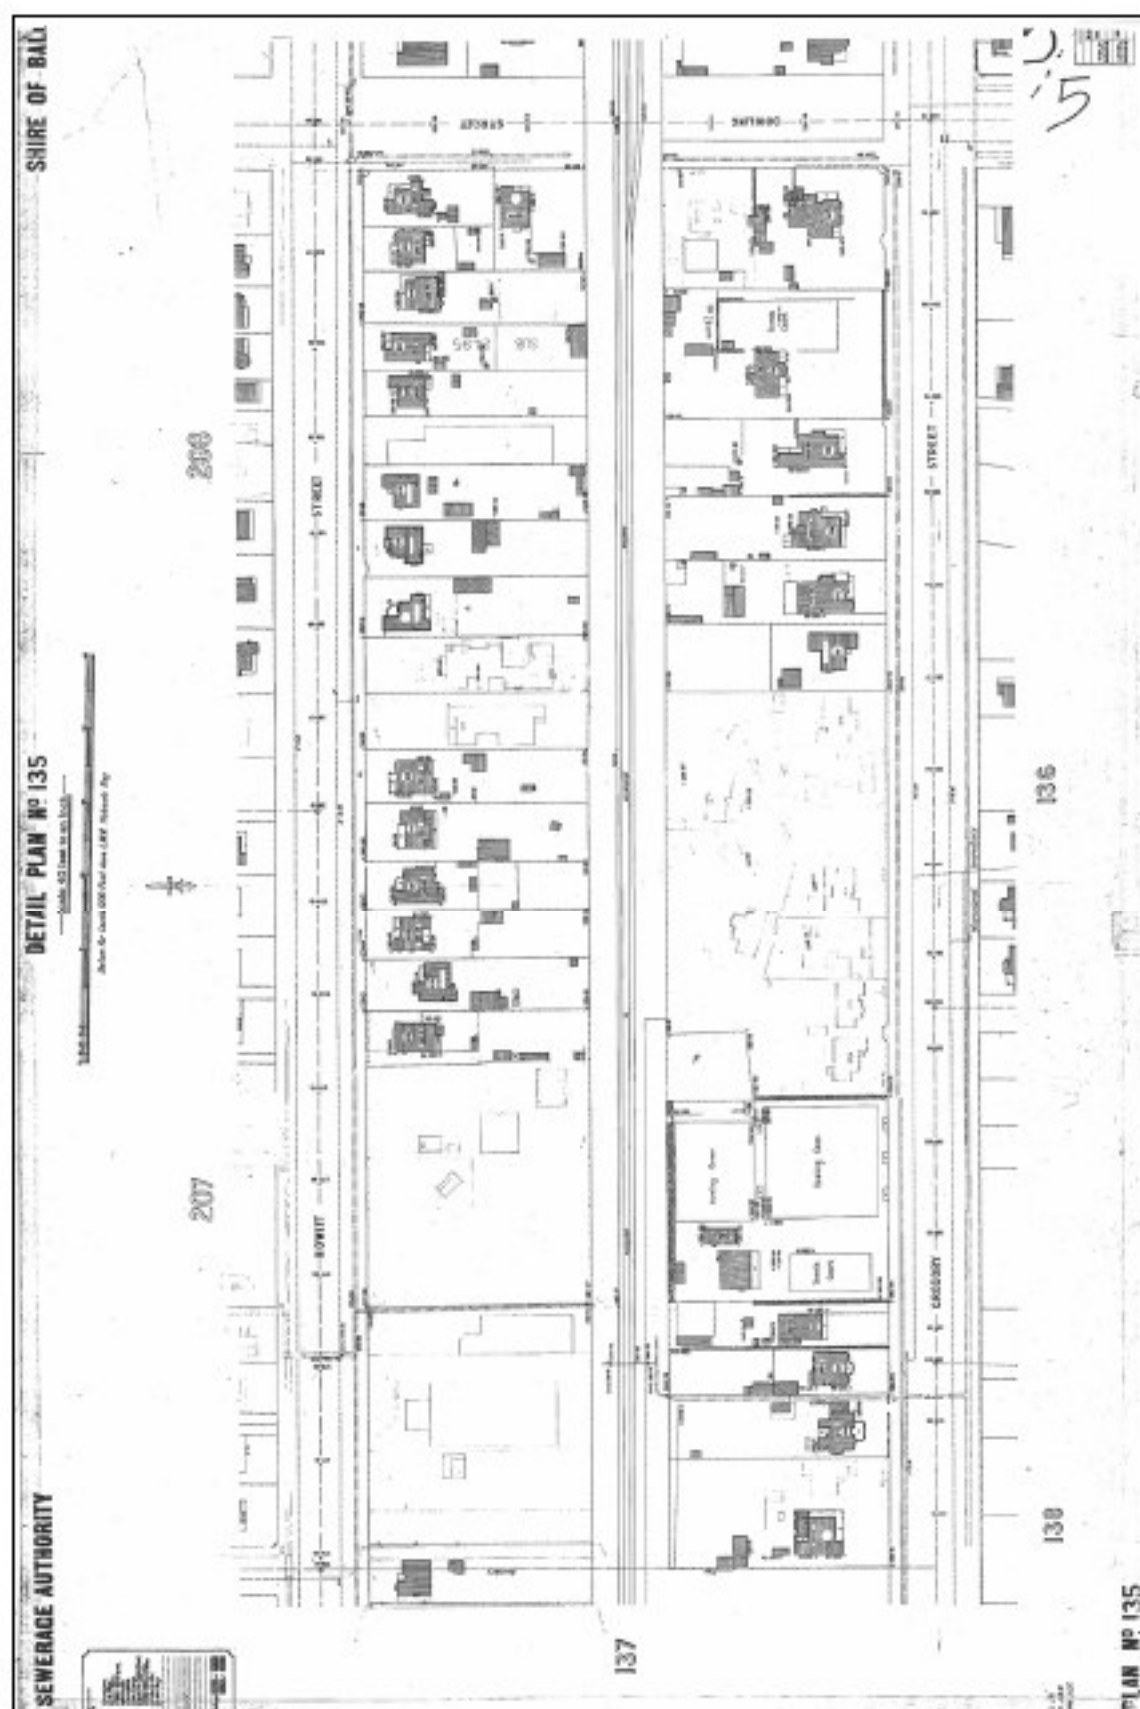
Ballarat Sewerage Authority Plan, 1940. Source: Planning Department, City of Ballarat.
